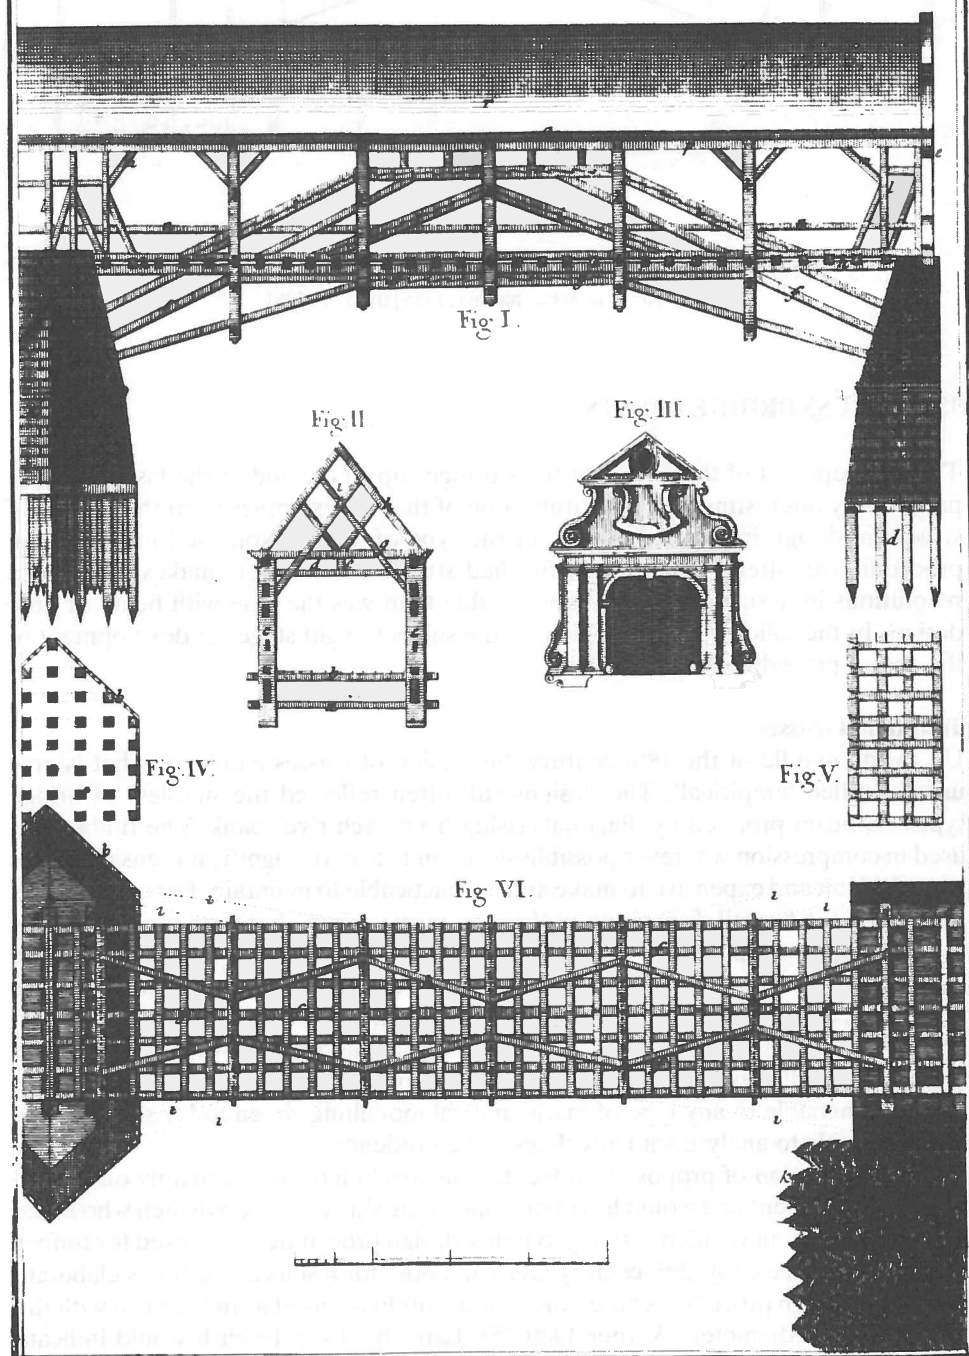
100-foot timber truss combining mainly beam action and 'propping'. The only tension members are the verticals (called '*Hängesäulen*'—hanging columns) which work in the manner of the Queen posts in a roof truss [Walter 1766]
